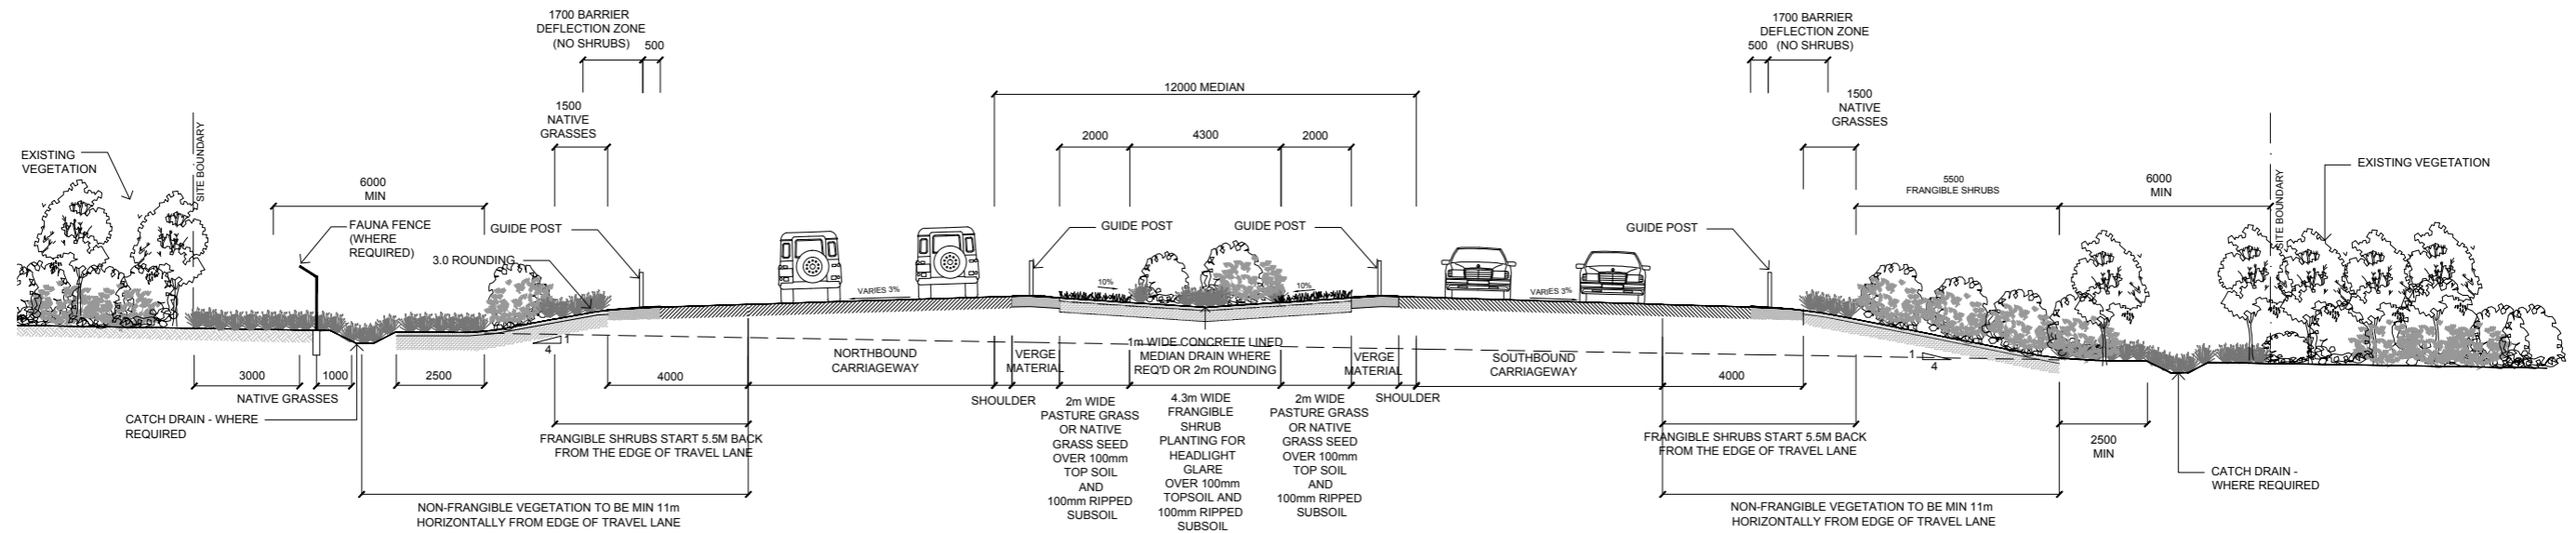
Typical Cross Section 1: Typical low embankment < 2.5m high - normal crossfall
